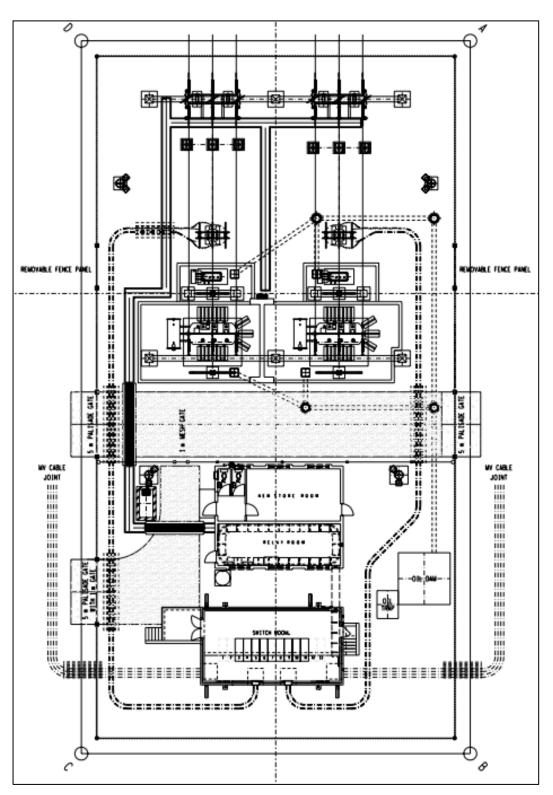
Layout - Iscor 66/11 kV Substation (Existing)
